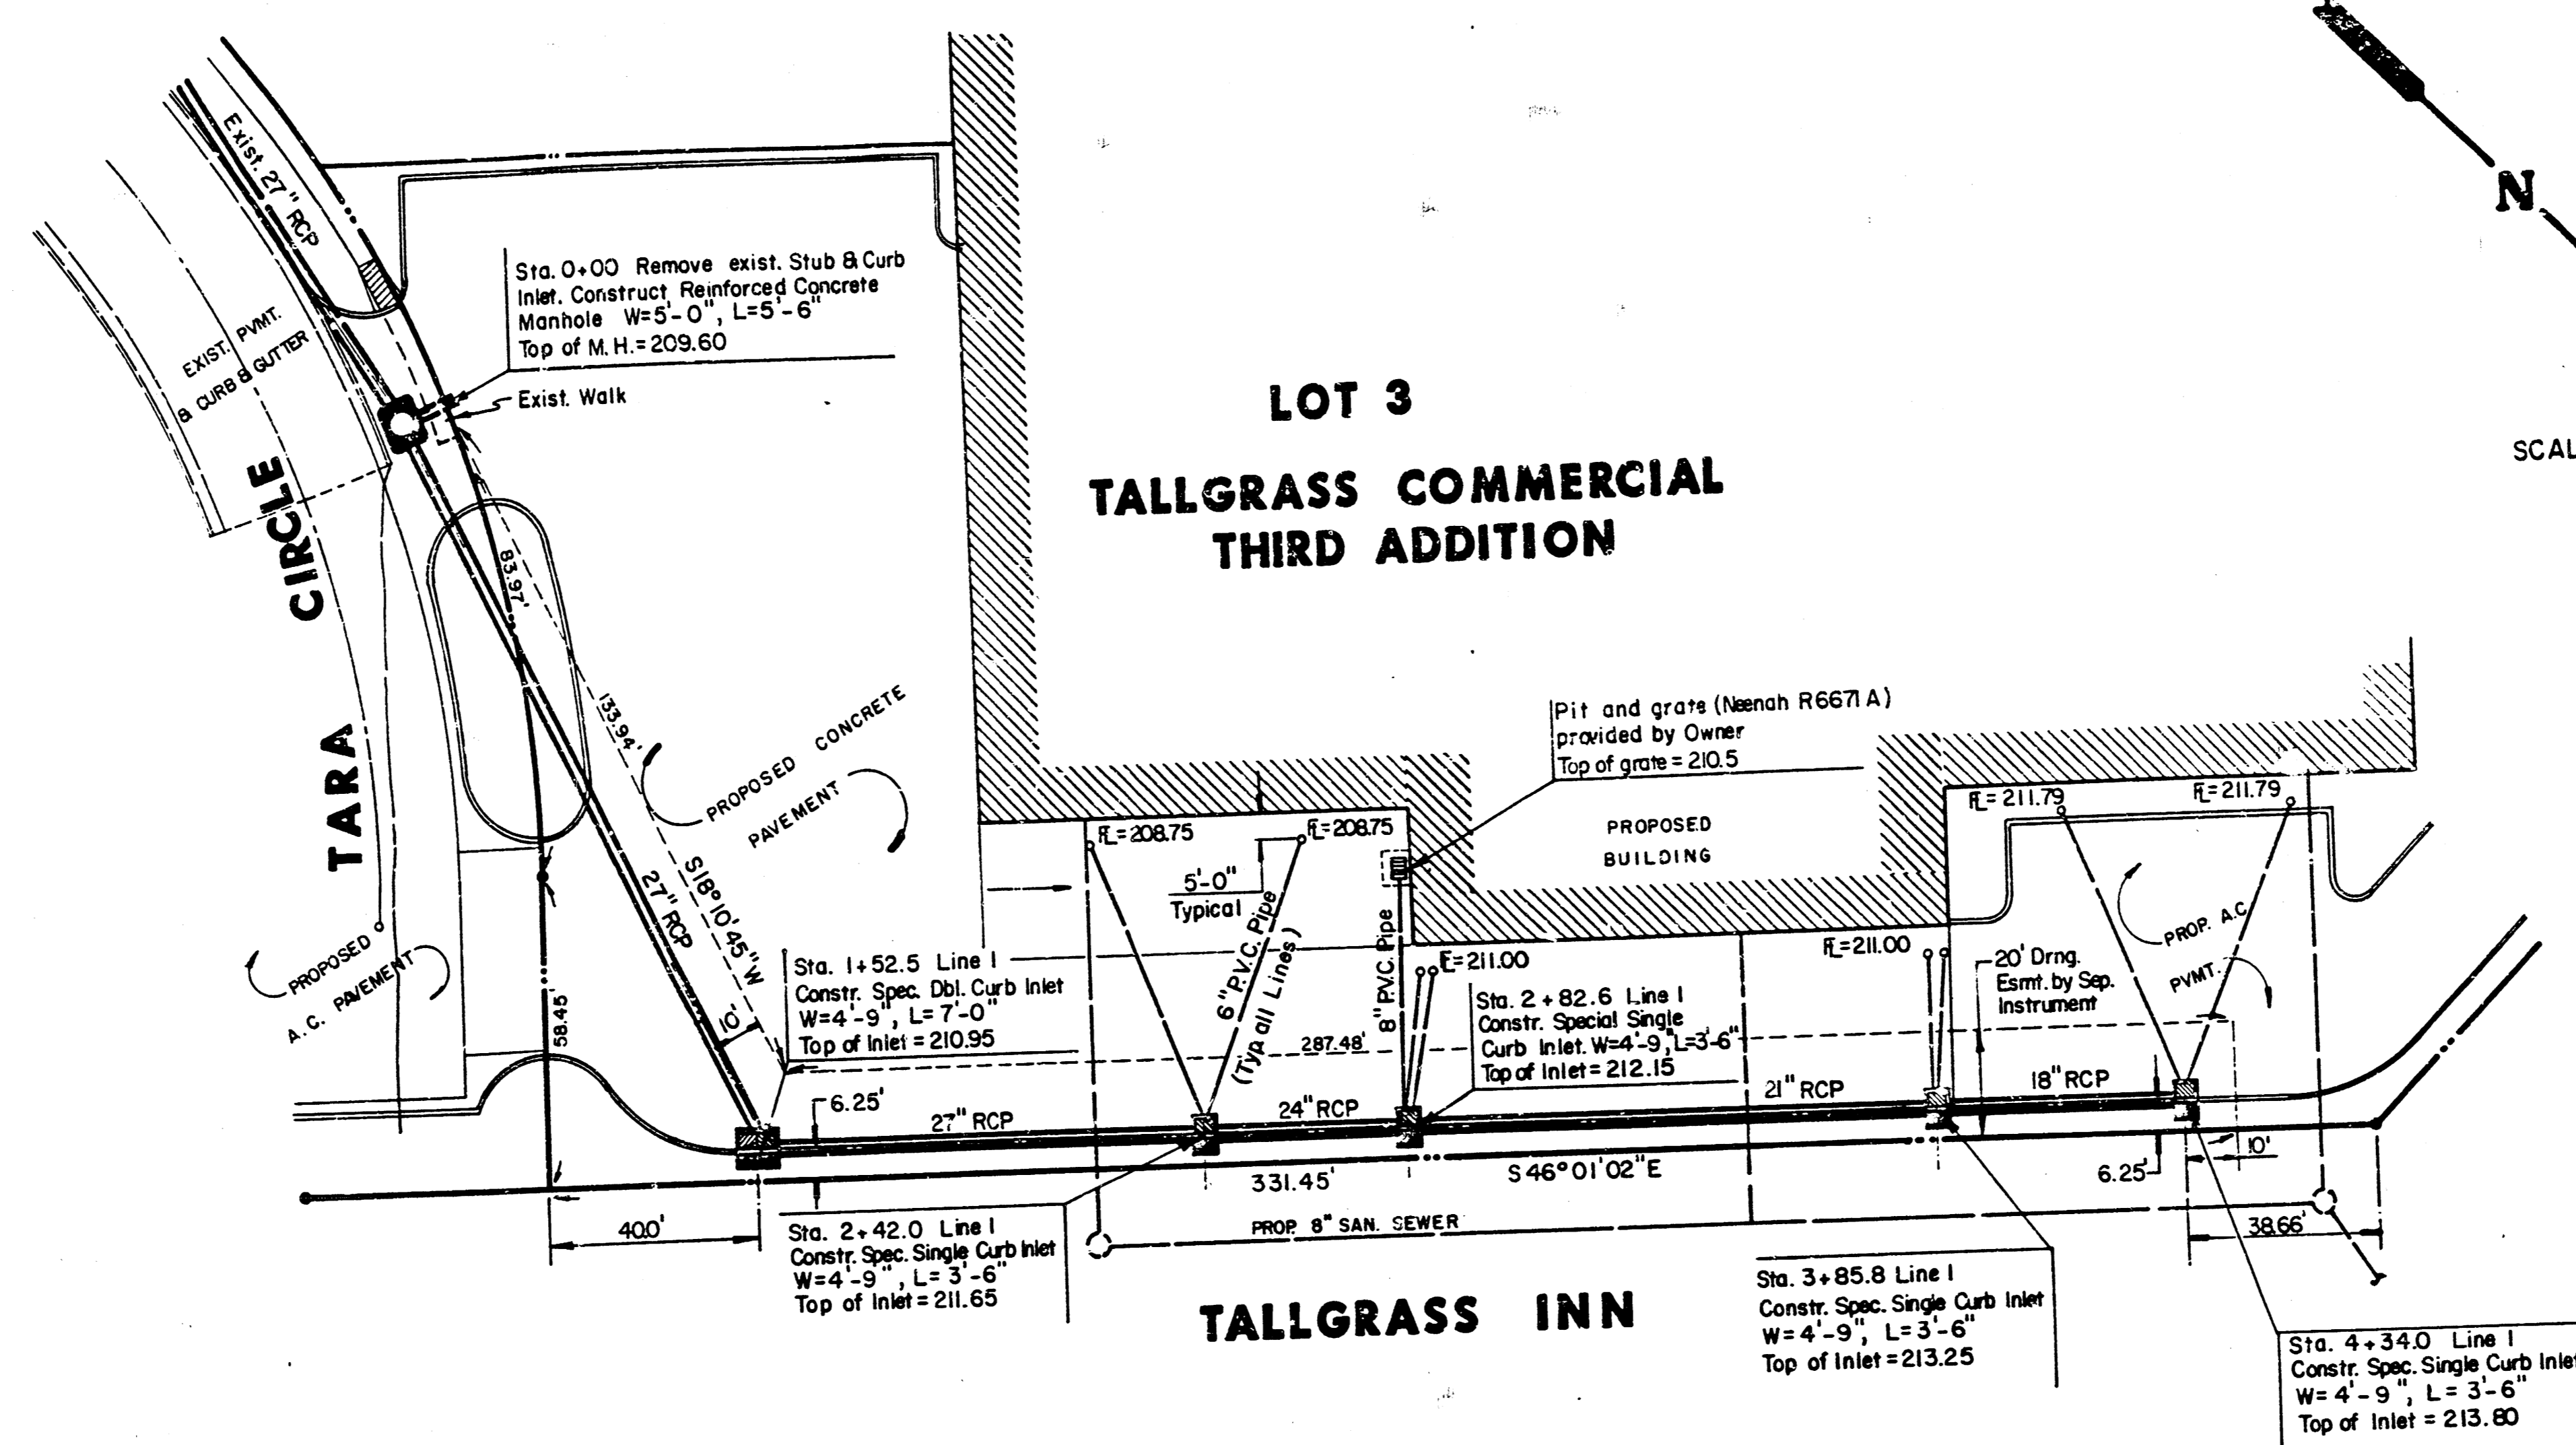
SINGLE PLAN AND PROFILE FULL LINE
